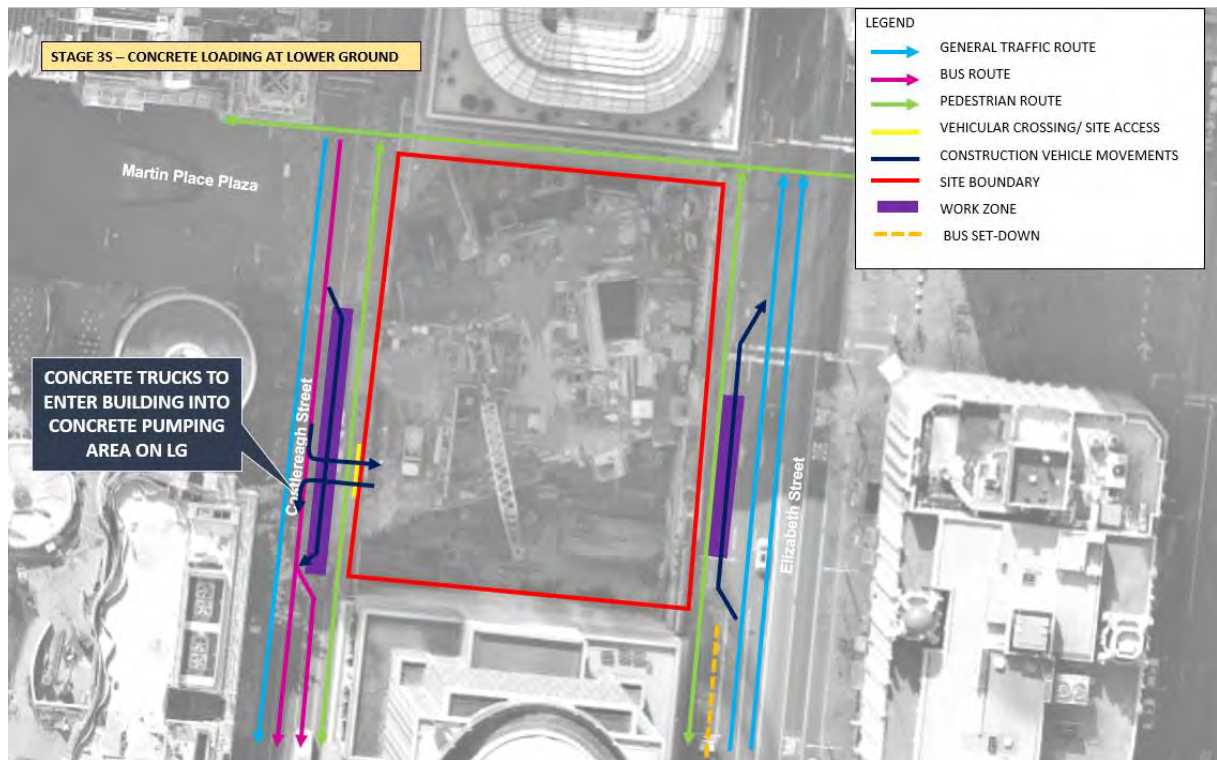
South Shaft Site Indicative Traffic Staging Plan
